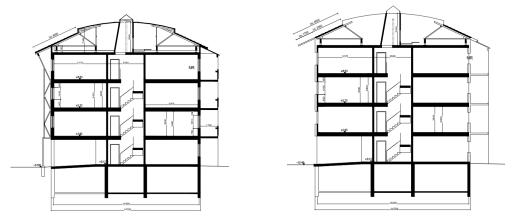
1. Present situation of the Figure 6.8: 2. Building Under renovation. buildings Removal of parts of the roof, overhangs, façade, lattice and balconies.
